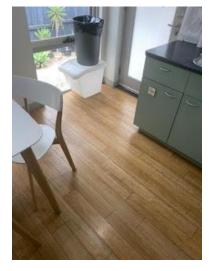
Existing Kitchenette looking towards rear exits – Needlepunch entrance mat to be installed at exits ->
